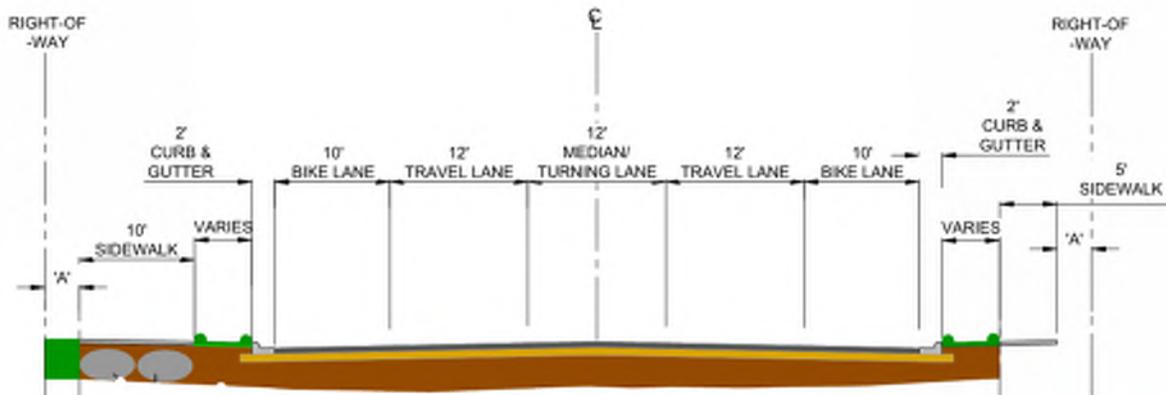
Proposed roadway section for Converse Avenue (facing north).
